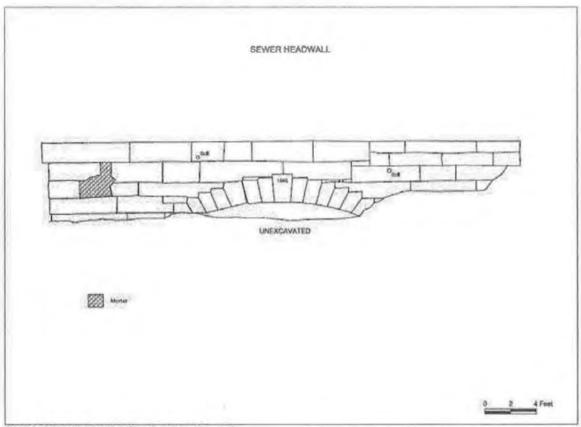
Elevation Drawing, Tiber Creek Sewer Headwall
